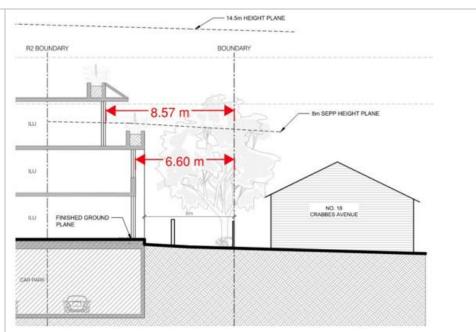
Extract of Section A for Block B showing setback from adjoining dwelling 18 Crabbes Avenue. (Source: Hyecorp/Amglen)
